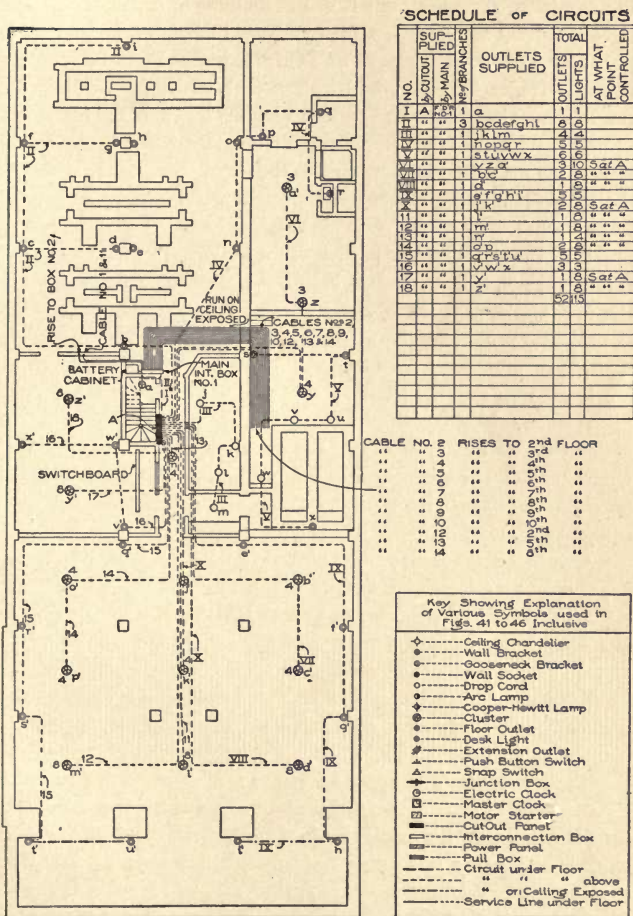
Wiring an Office Building. Basement Plan Showing Branch Circuit Wiring for Outlets in Basement, Location of Main Switchboard, and Trunk Cables of the Interconnection System Providing Wires for Telephone, Ticker, and Messenger Call Service, etc.
